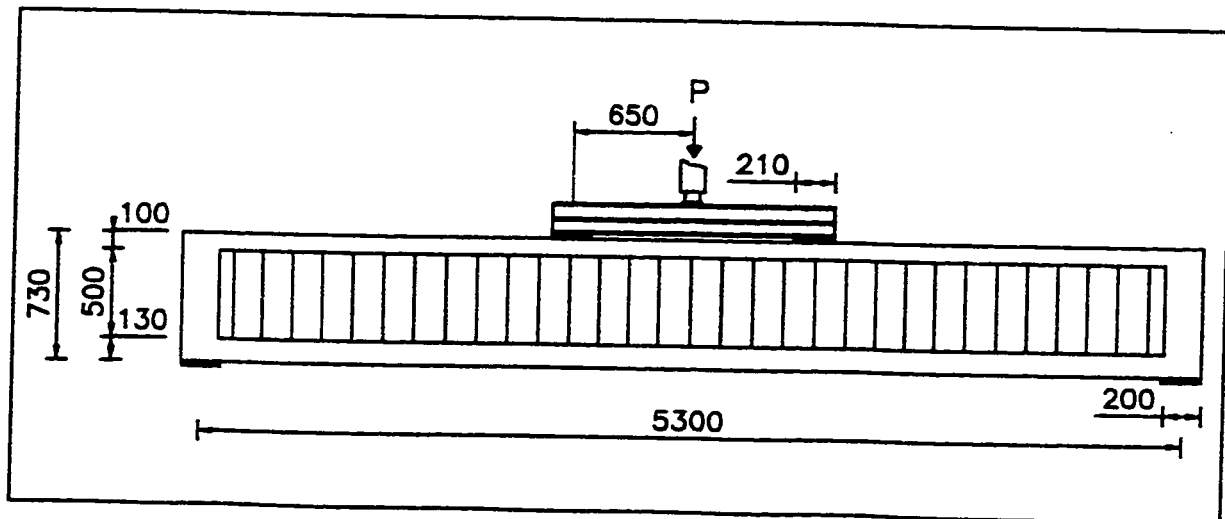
Typical elevation view of the test girder and the loading transfer beam
